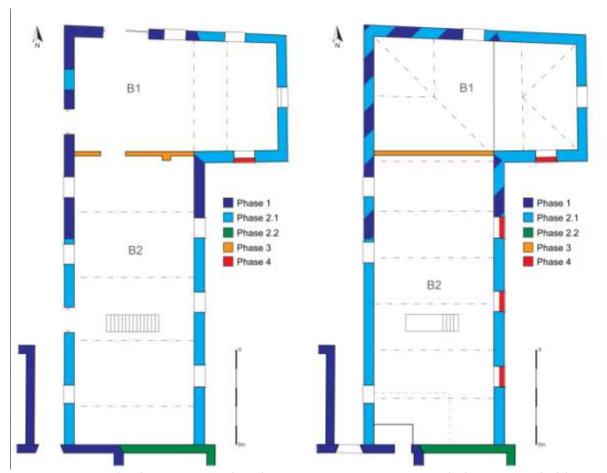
GROUND- (LEFT) AND FIRST-FLOOR (RIGHT) PHASED PLANS OF THE POUND HOUSE (B1) AND SHIPPON (B2) (BASED ON SUPPLIED DRAWINGS).
